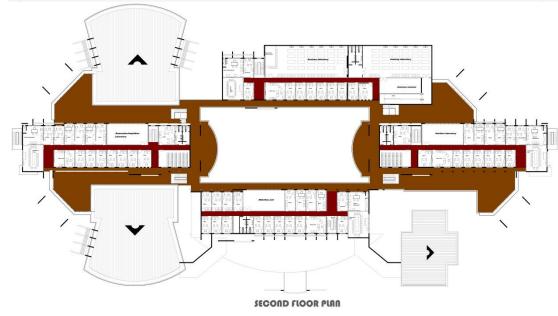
Second Floor Plan of the Faculty of Medicine. Source: Author's sketch, 2017
